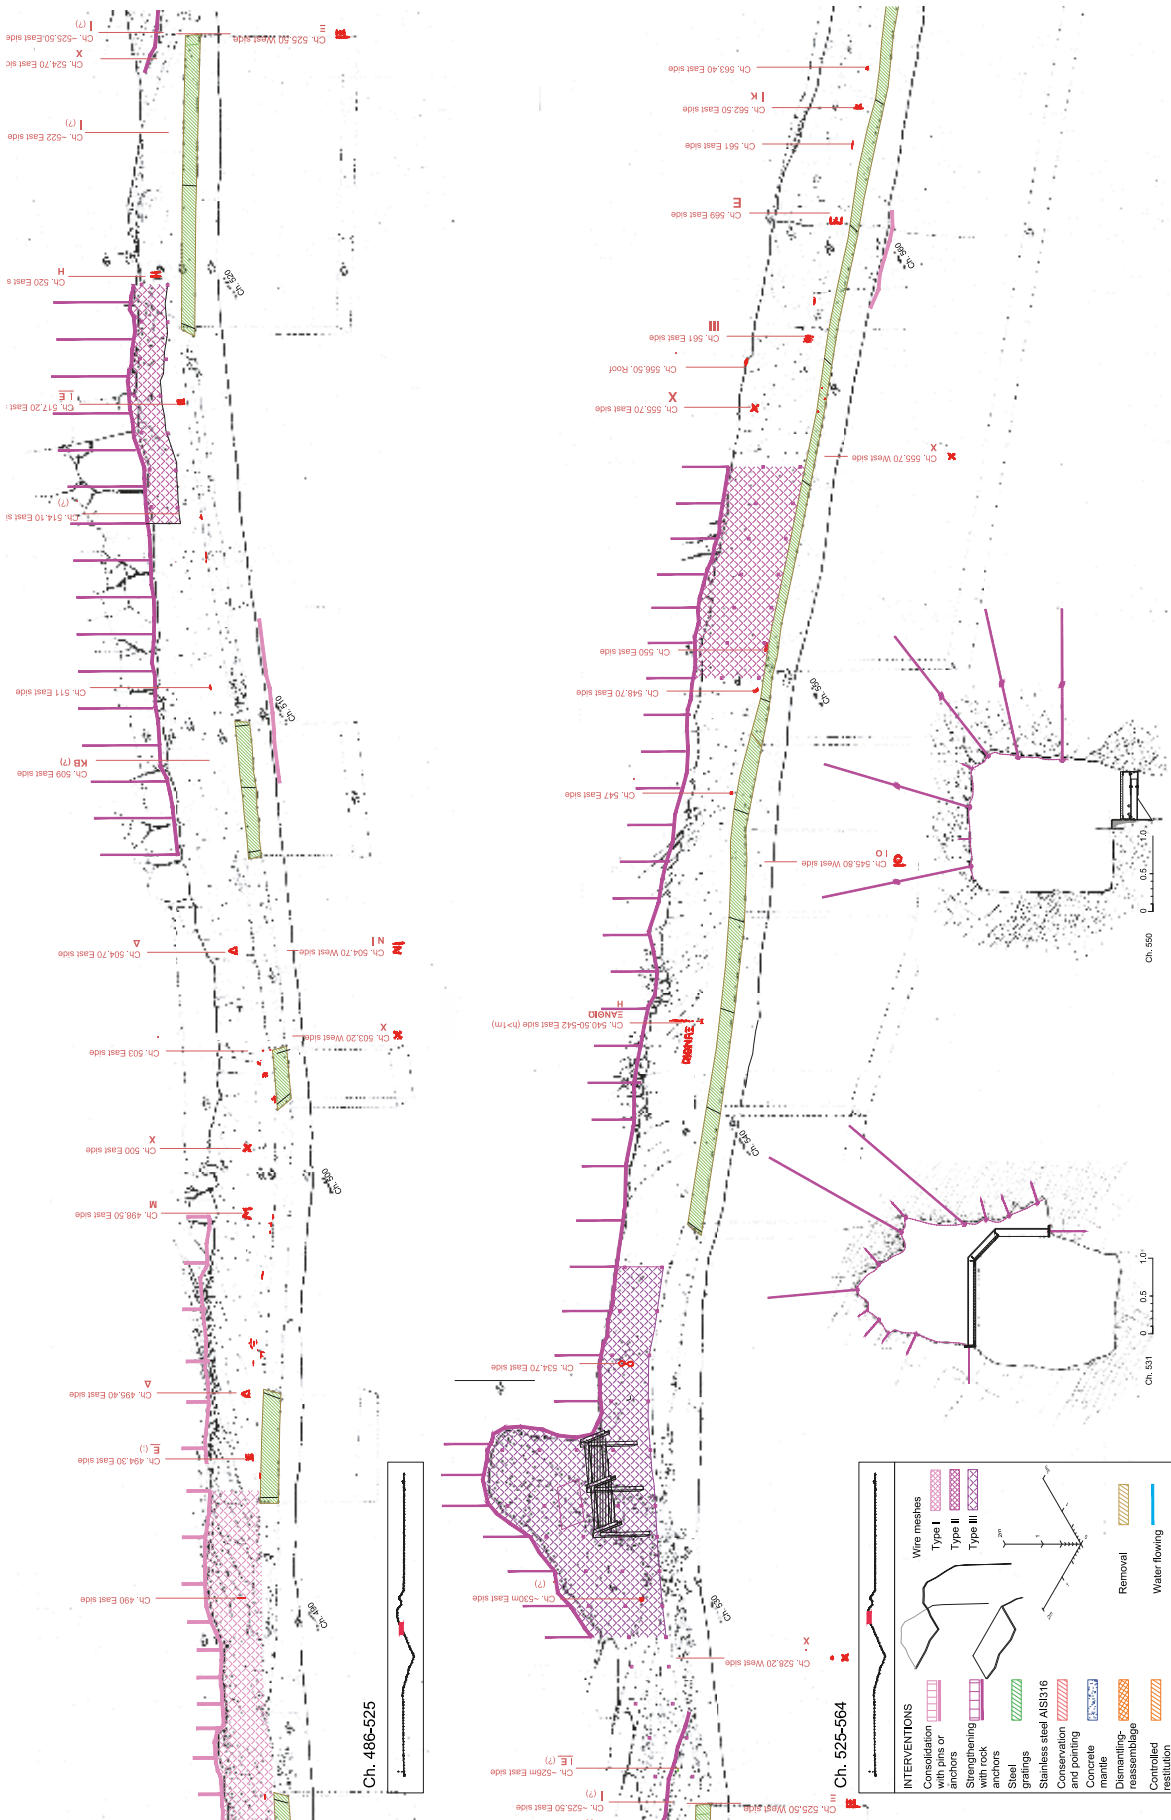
Isometric plan of the tunnel of Eupalinos (scale 1 : 200) with sections (scale 1 : 100), Ch. 486-564
